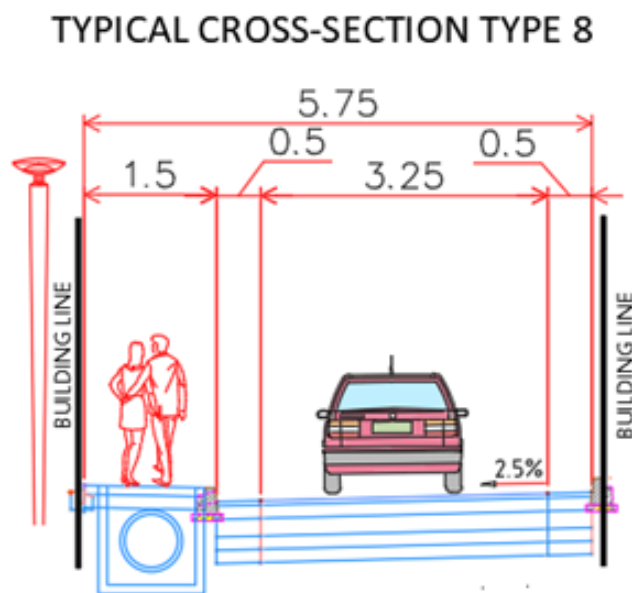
Typical Cross section Type 8 one-way Feeder Road
